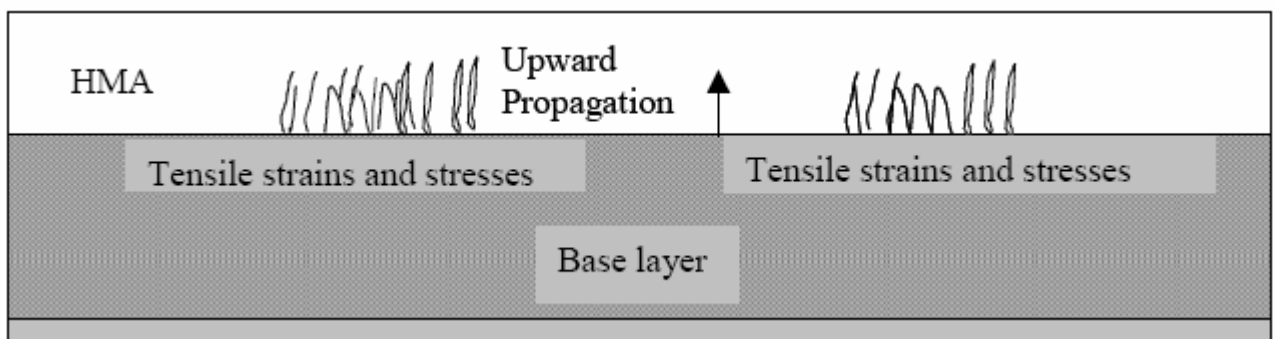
Bottom-up fatigue cracking [4]
